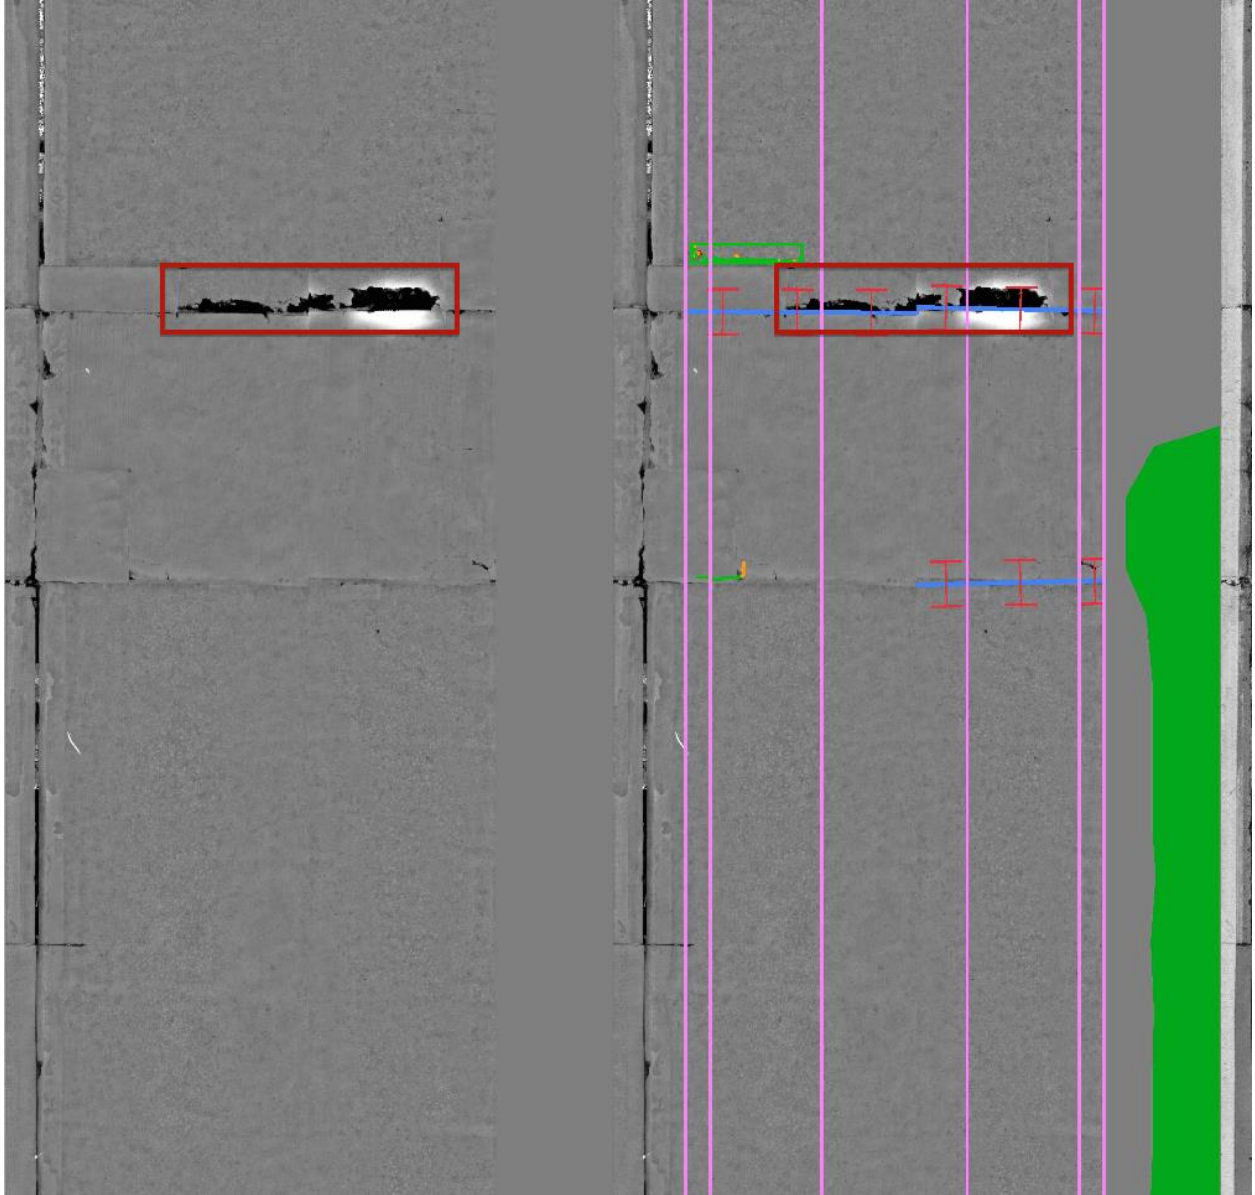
Low-severity joint deterioration is characterized by spalls less than 3 inches wide with no significant loss of material. Single cracks in the corner of the slab will be counted toward cracking.
